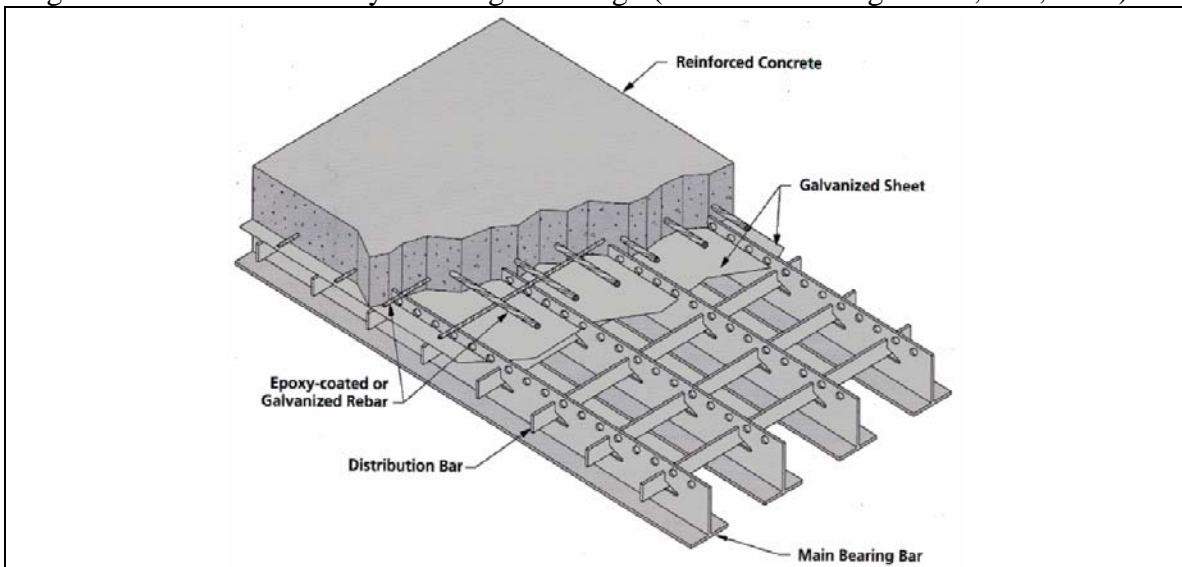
Exodermic Deck System revised design (Exodermic Bridge Deck, Inc., 1998)
